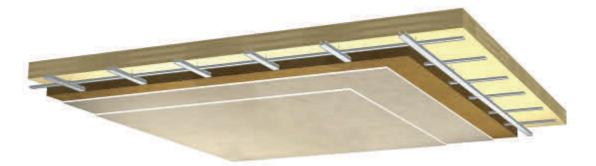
CLT Floor Sound-Insulated Underneath the Floor/Ceiling
